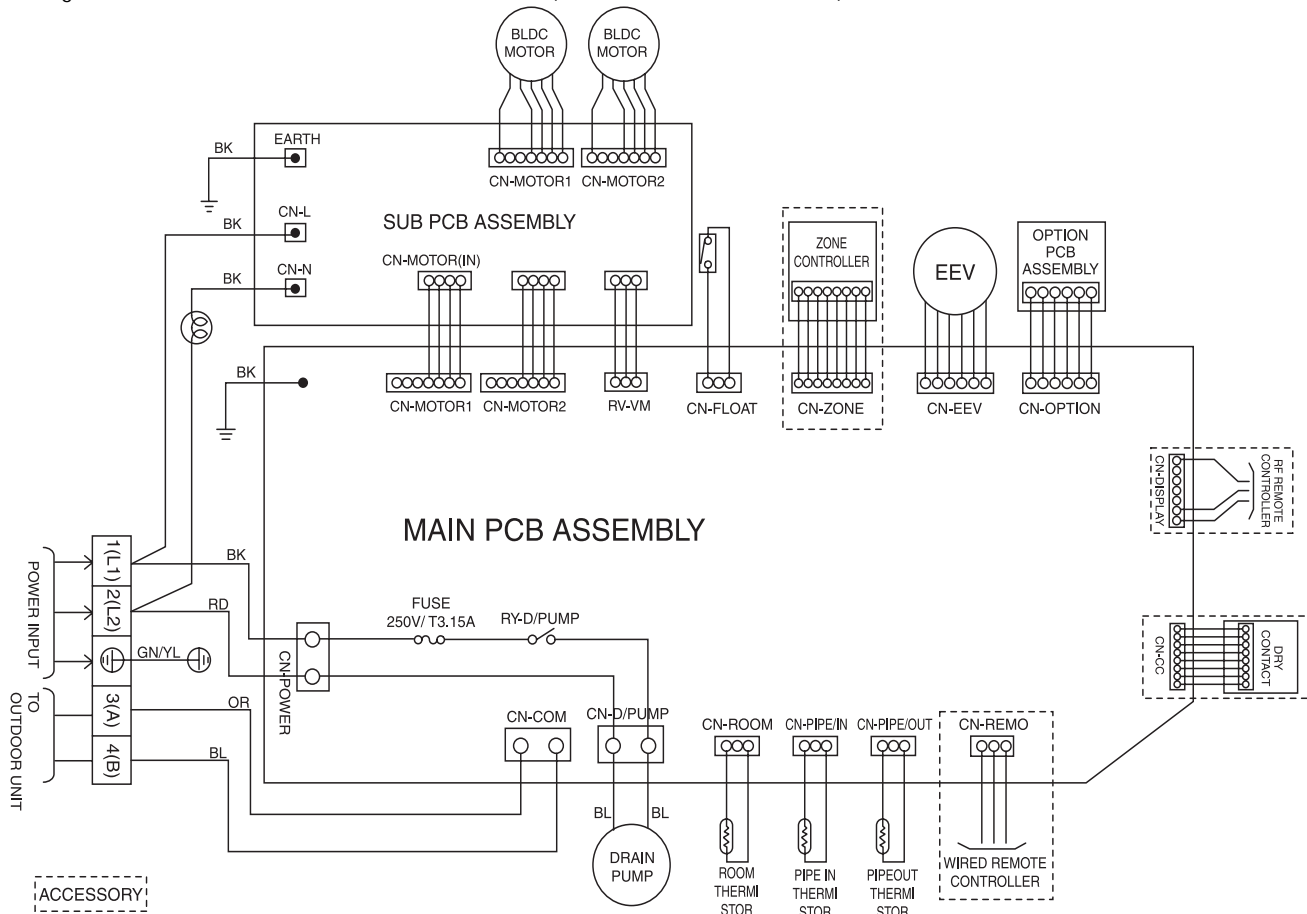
High-Static Ducted Indoor Unit Printed Circuit Board (Dual Motor - BG, BR Frames).
